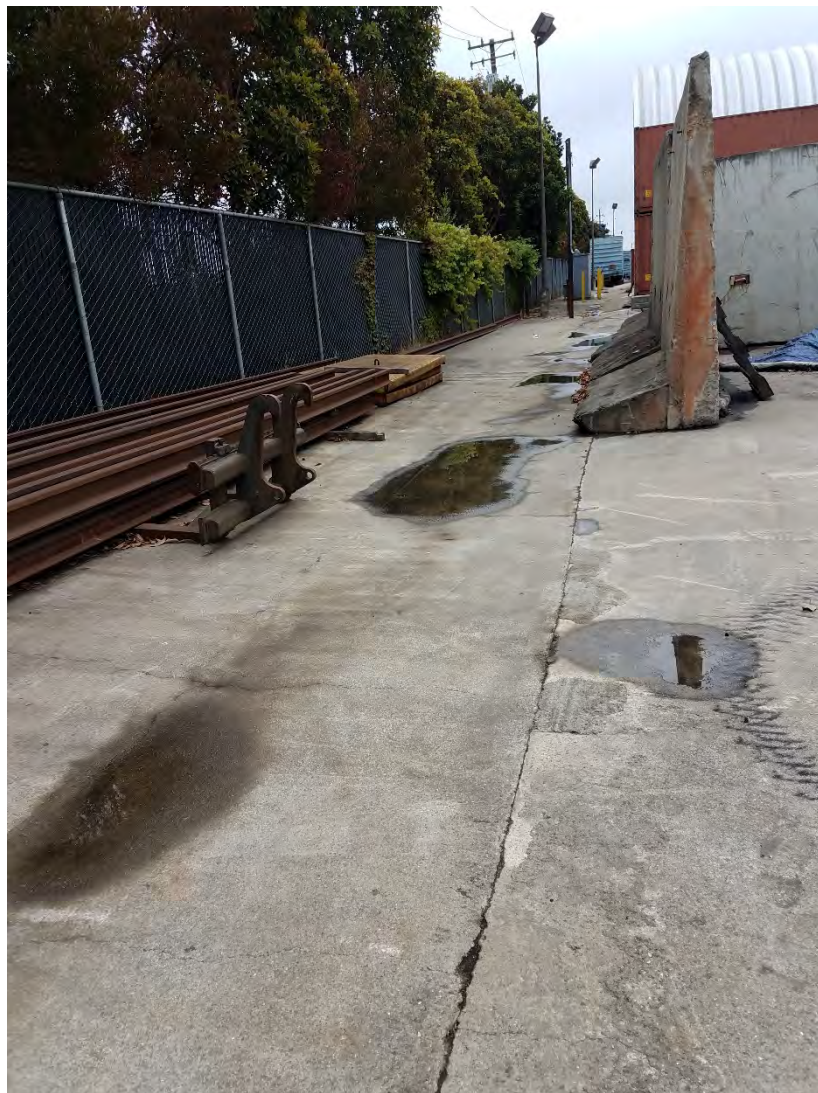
Looking south: seams and surficial cracks in swale on eastern perimeter of site.
